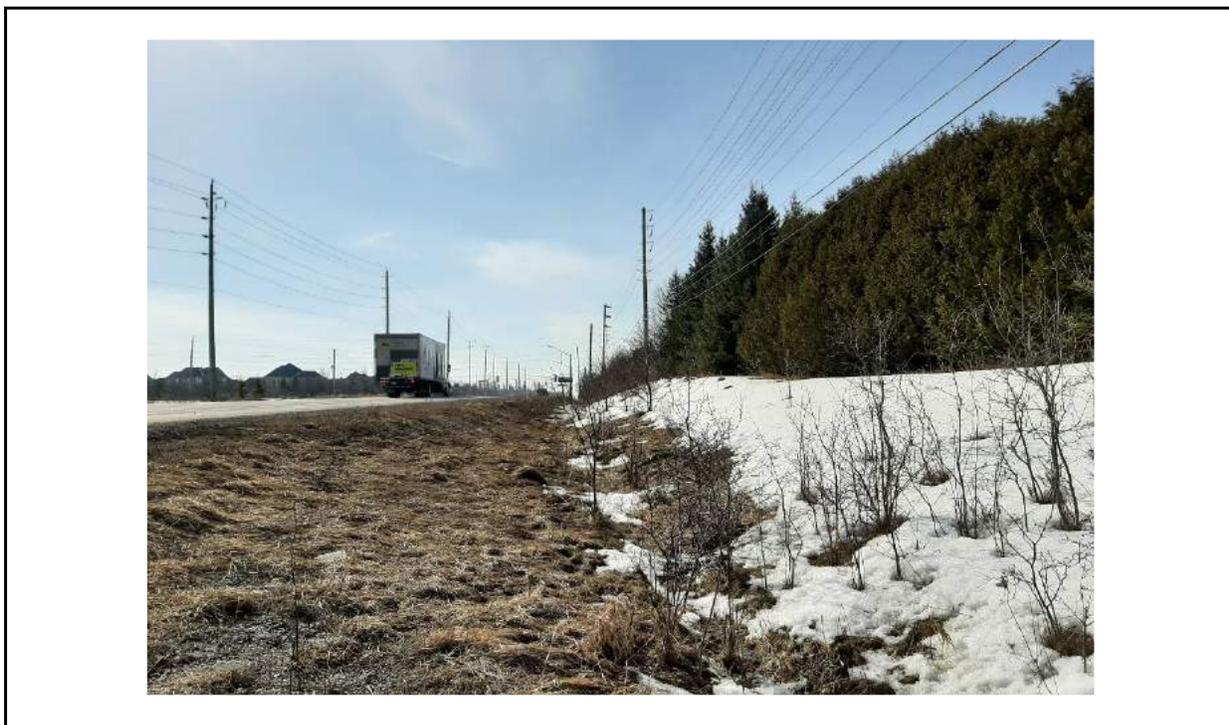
Northeast Corner of Project Limits, Looking Southwest
